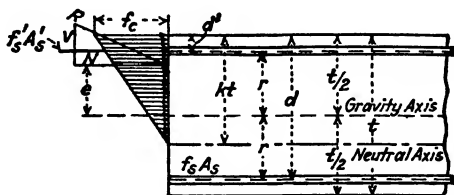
Stresses caused by a force producing compression and tension upon a reinforced section, tensile strength of concrete neglected.
